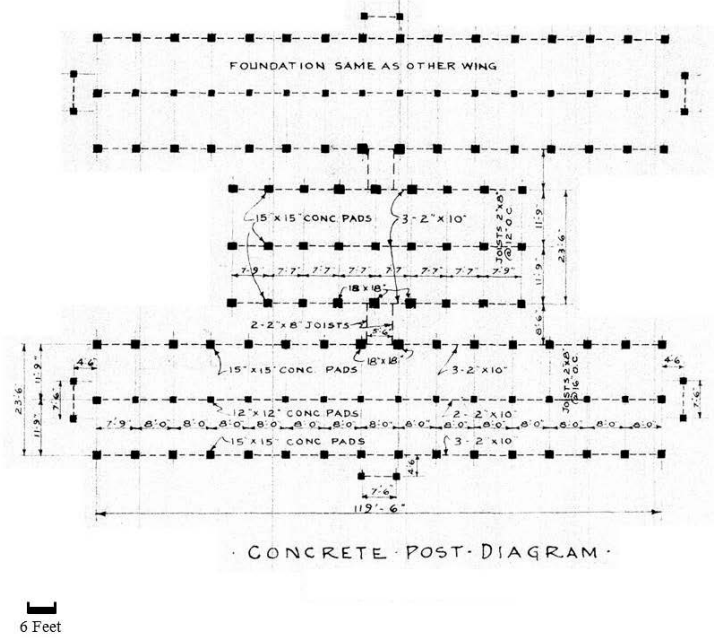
RCAF generic architectural plan, foundation detail. Note the post and pier style foundation pads. (Courtesy of the Commonwealth Air Training Plan Museum)
